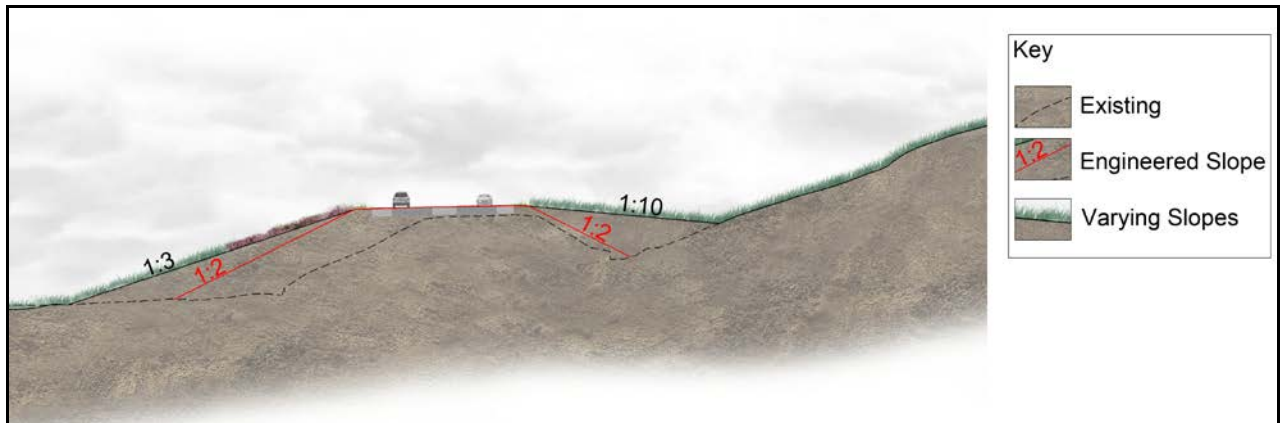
Illustrative cross section showing typical landscape revisions to earthworks slopes
